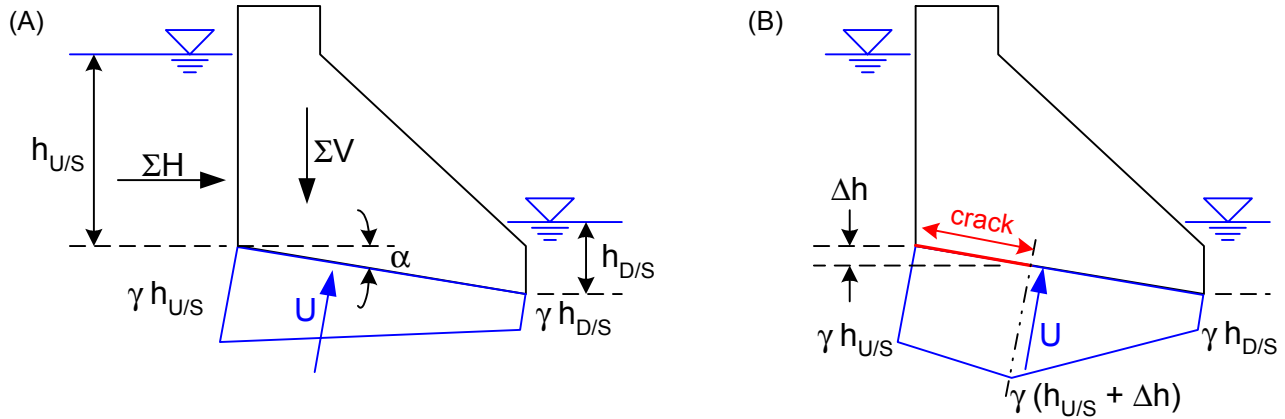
Dam with sloped joint (a): uncracked; (b) cracked.
